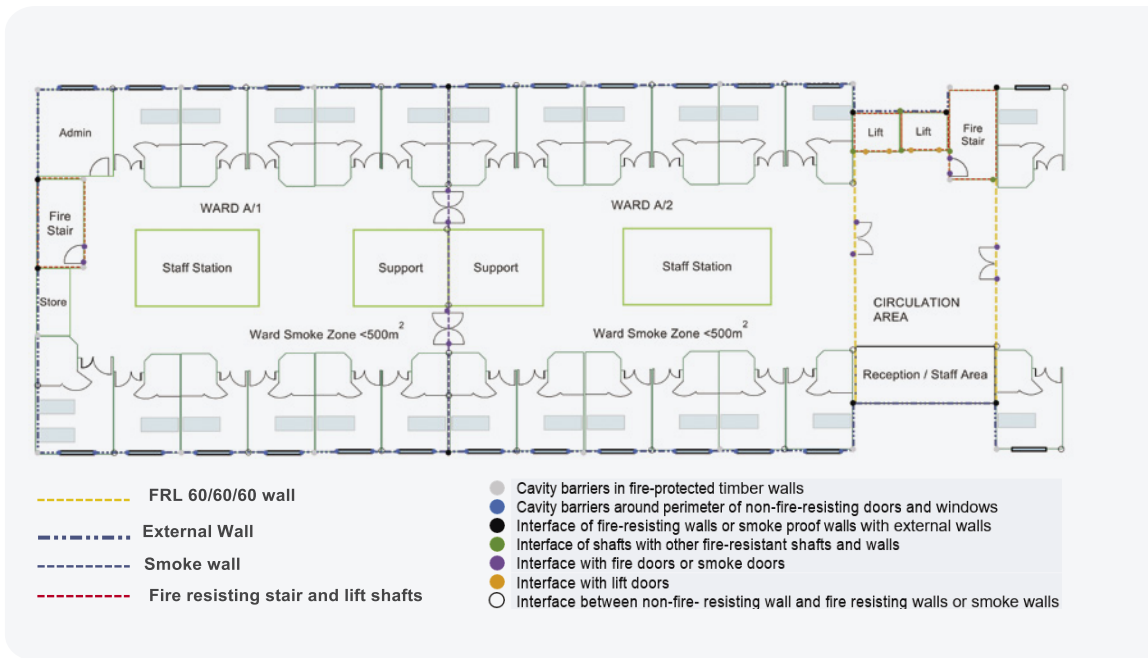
Floor plan section of a Ward area of a Class 9a building showing typical cavity barrier locations.
